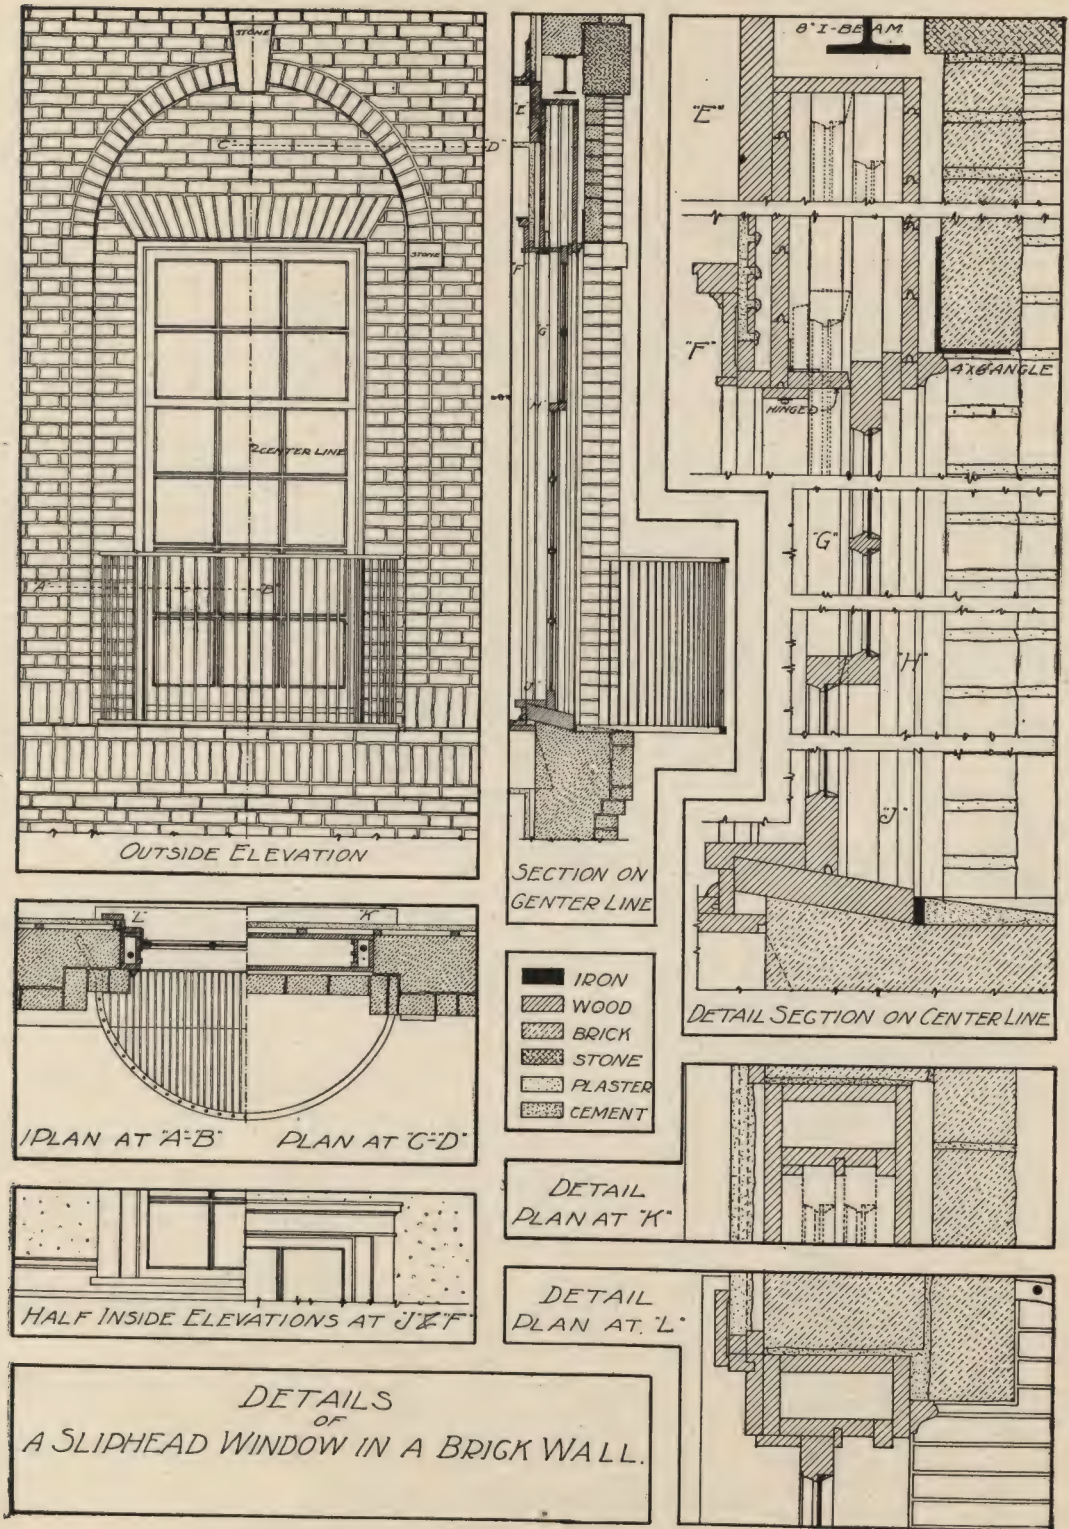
SLIPHEAD WINDOW IN A BRICK WALL.
